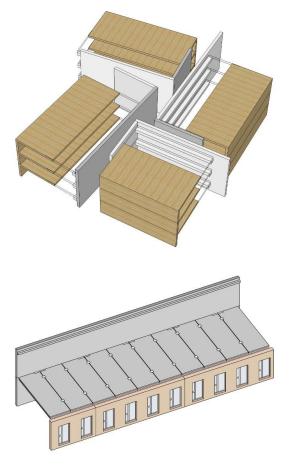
Diagrams demonstrating construction approach for Vancouver House in Vienna (source: Rüdiger Lainer + Partner).
